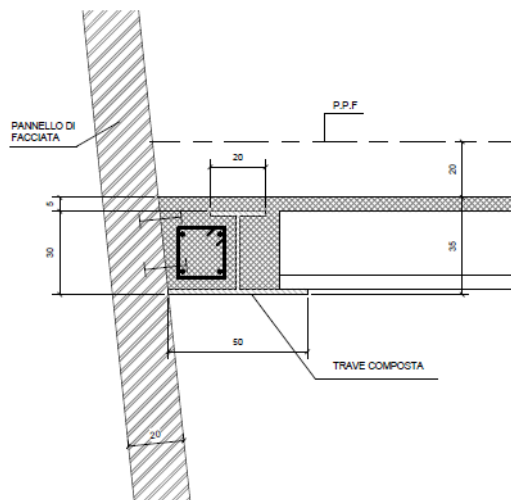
Detail of the connection between concrete precast wall panels and edge composite beams of floor structure.
